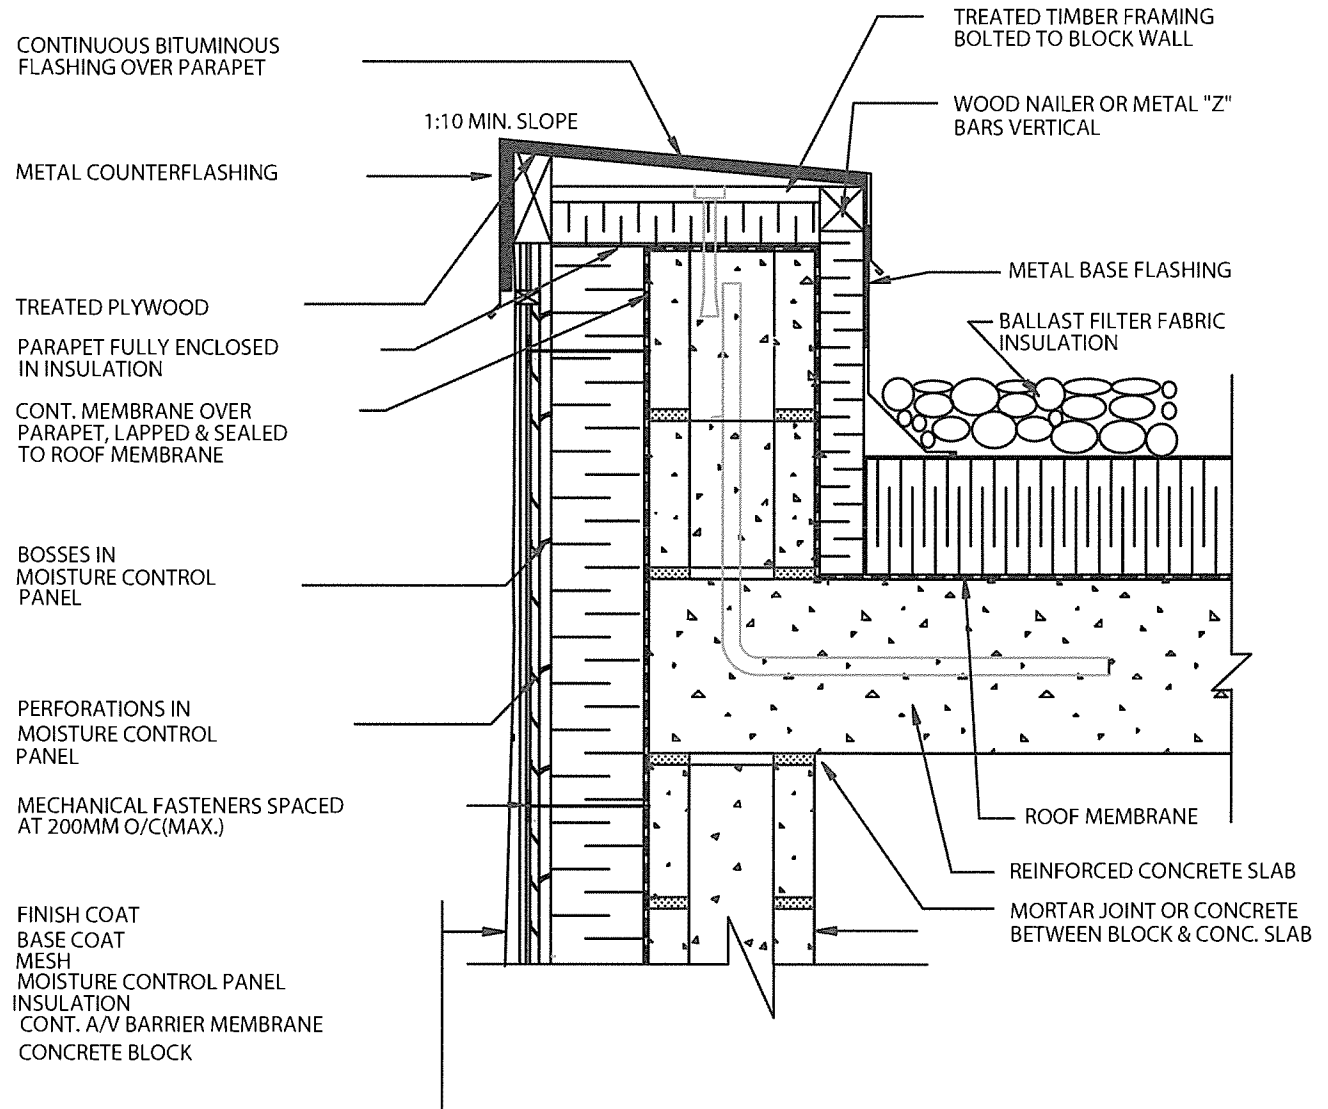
ACRYLIC STUCCOO/CONCRETE BLOCK DETAIL AT SLAB EDGE
